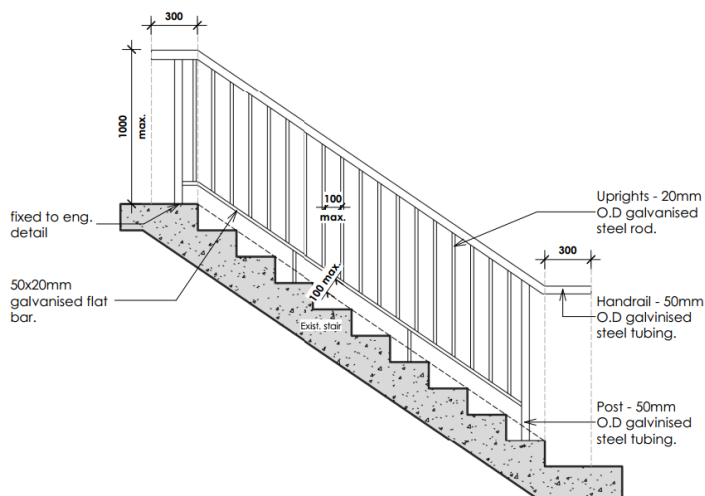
Staircase 6 (see site plan) – to receive safety handrails on both sides.
